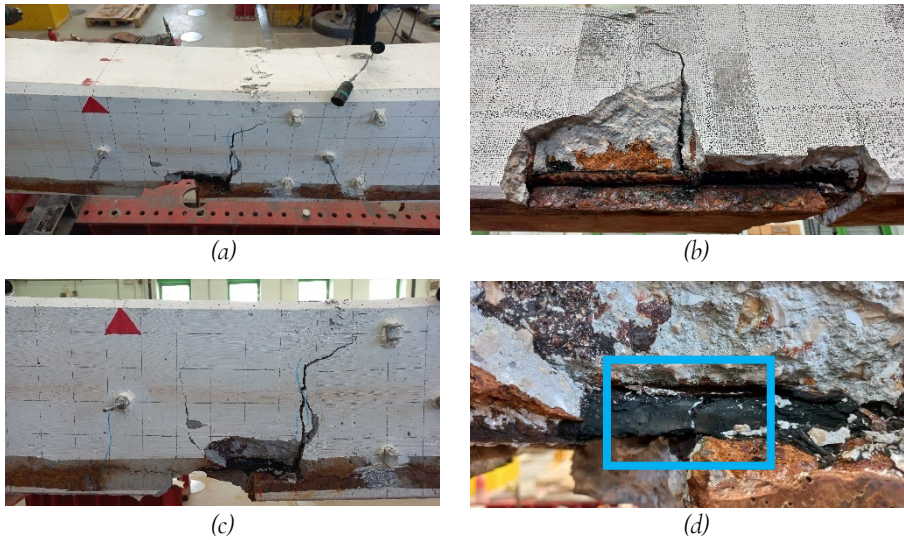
Details of failure condition for specimen RC-C6 (a) Top view with very little signs of the beginning of concrete crushing; (b) View of the side with speckle pattern, with visible spalling of the lateral cover; (c) View of the side with LVDTs, with a visible main flexural crack which developed right in the zone with LVDTs; (d) fractured corroded steel rebar
